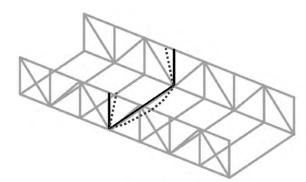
U-Frame action a) I-shaped girders - addressing lateral torsional buckling
